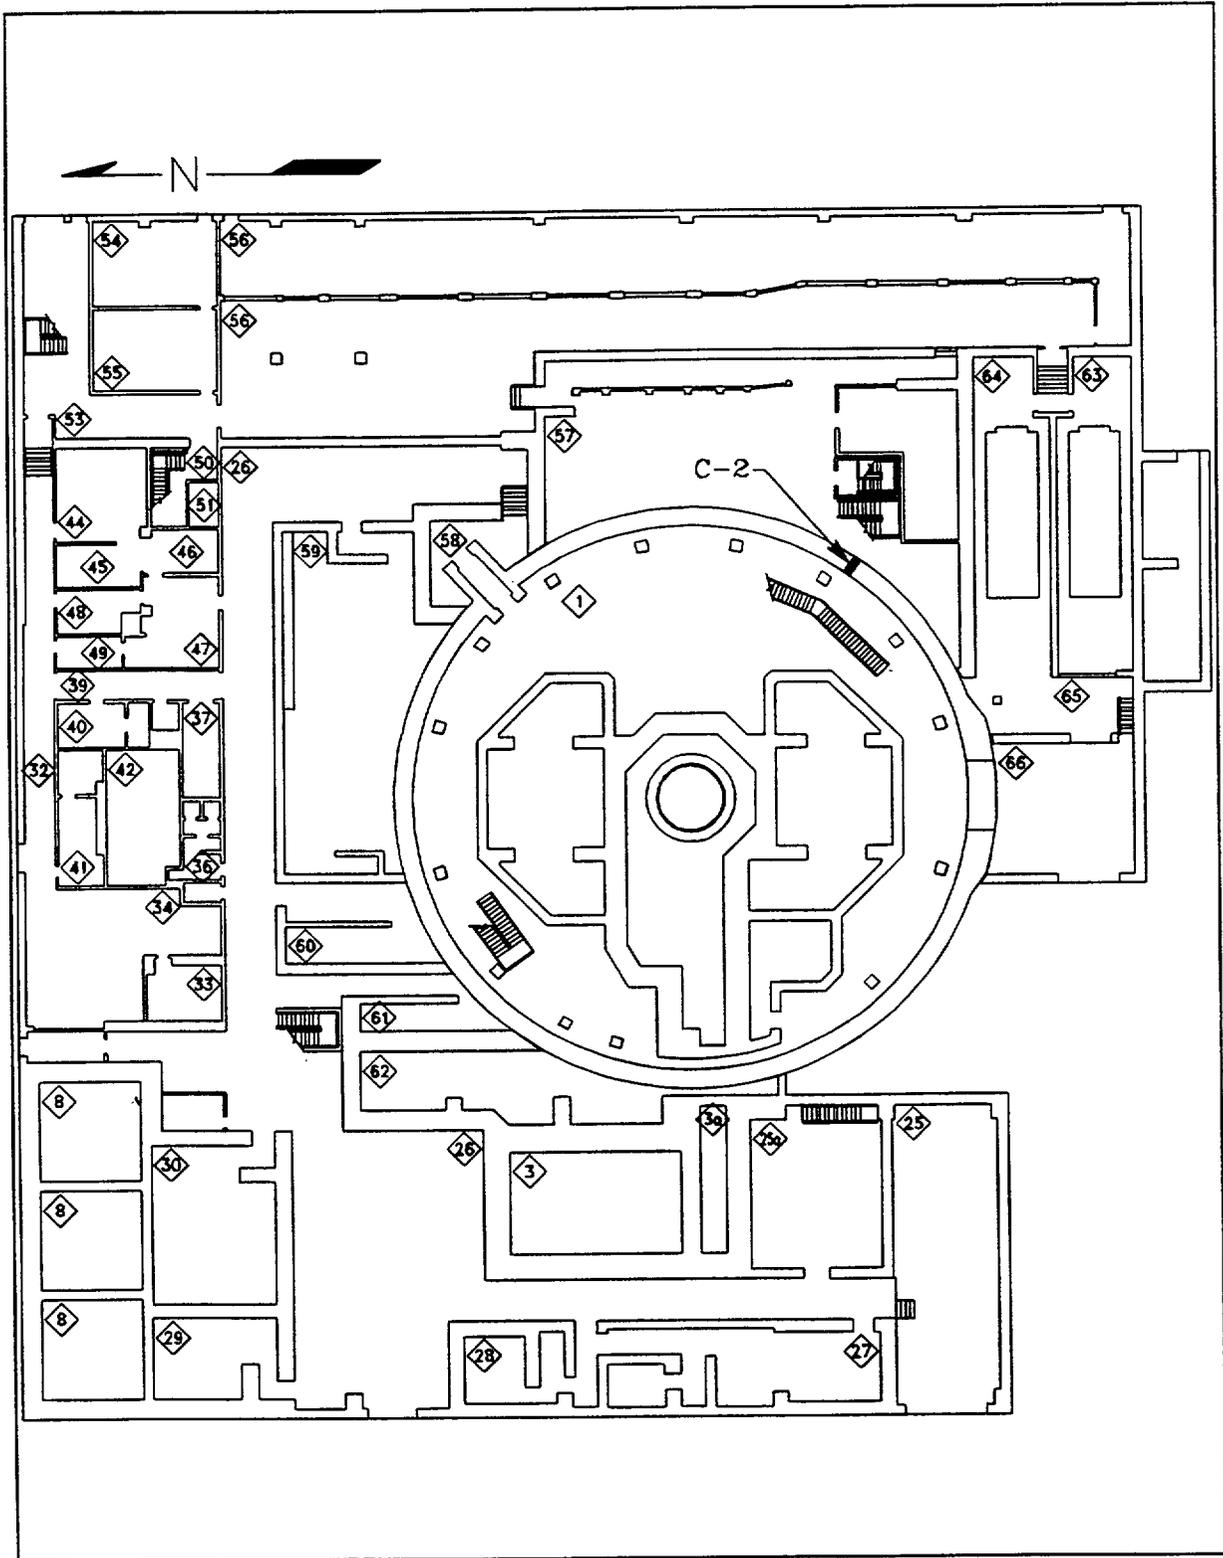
Auxiliary Building - Plant Elevation 1036'-0
